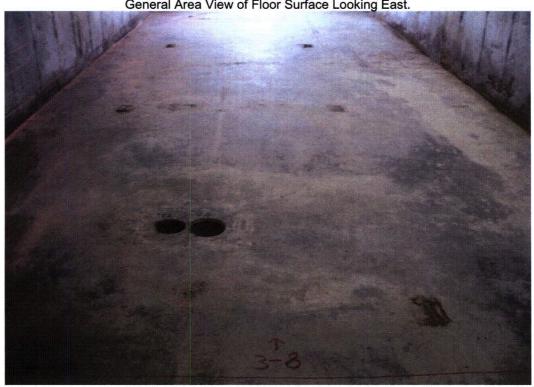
, SEB Cold Pipe Tunnel Floor (Survey Unit SE-3-8)
